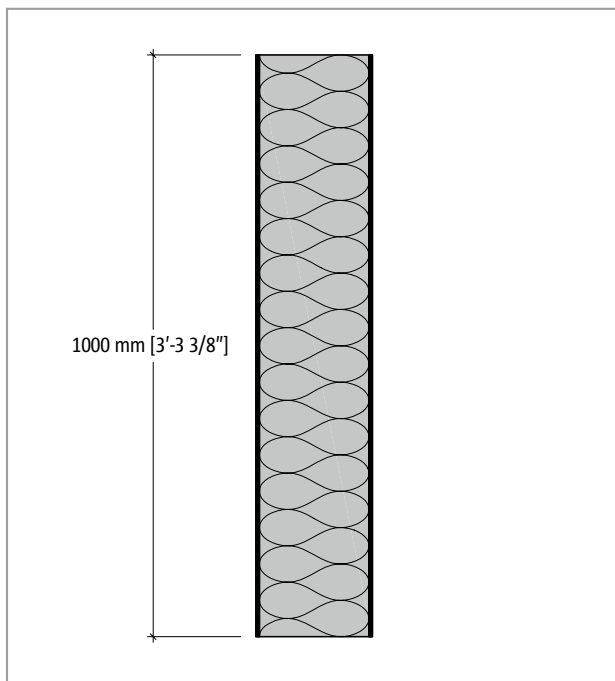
Schöck Isokorb® CXT Type CA Part Z: Product top view
